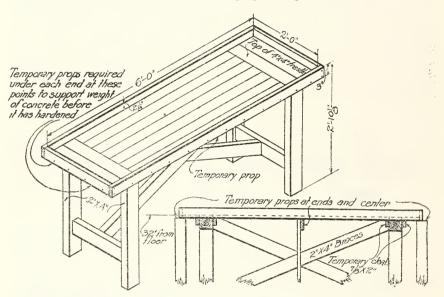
Method of building a workbench of which the top is cast of concrete
